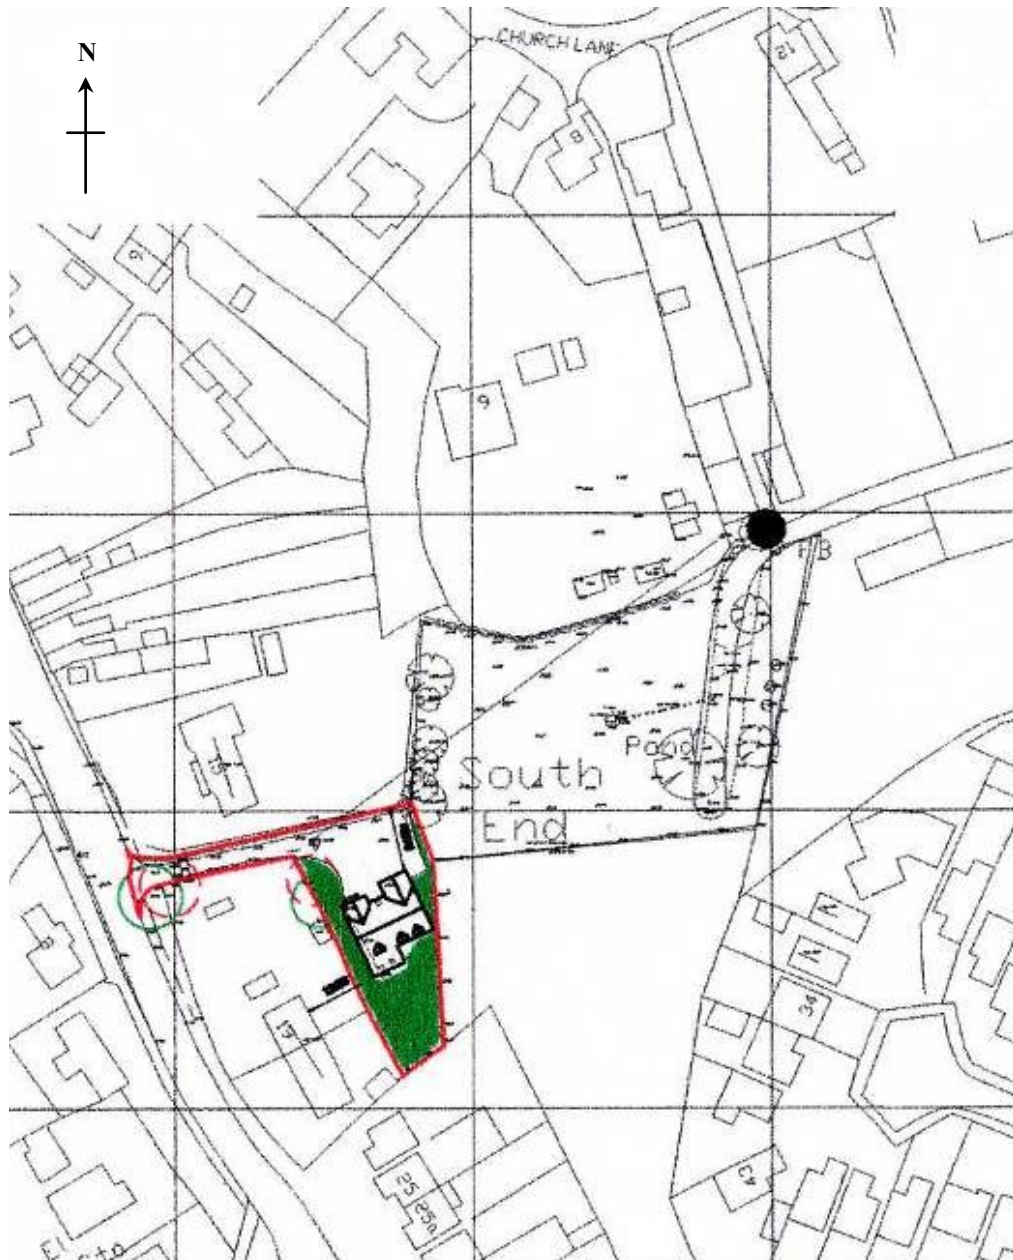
Location plan of the site at scale 1:1250. Plan supplied by client.
